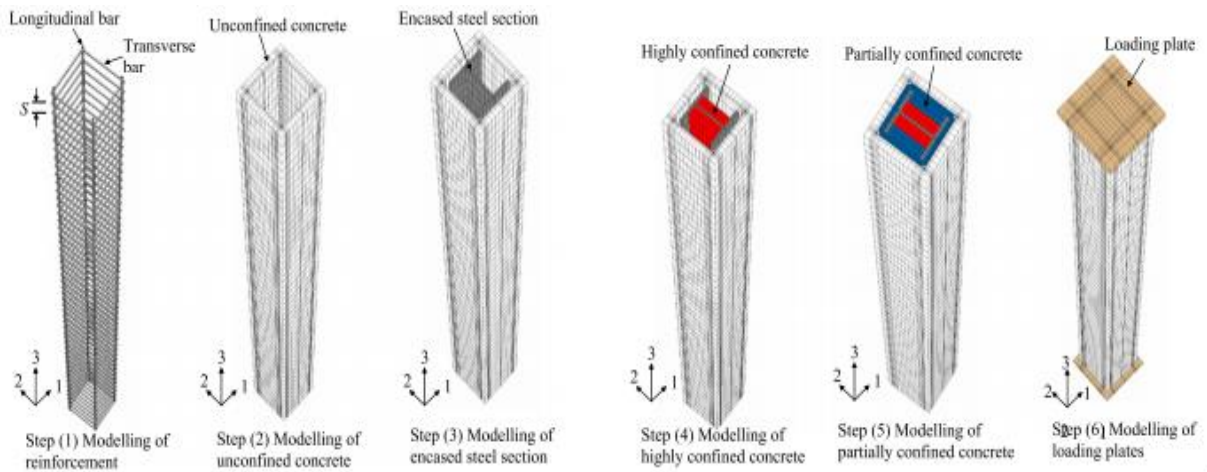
Modelling steps of concrete encased steel composite columns. Young and Ellobody (2010)
